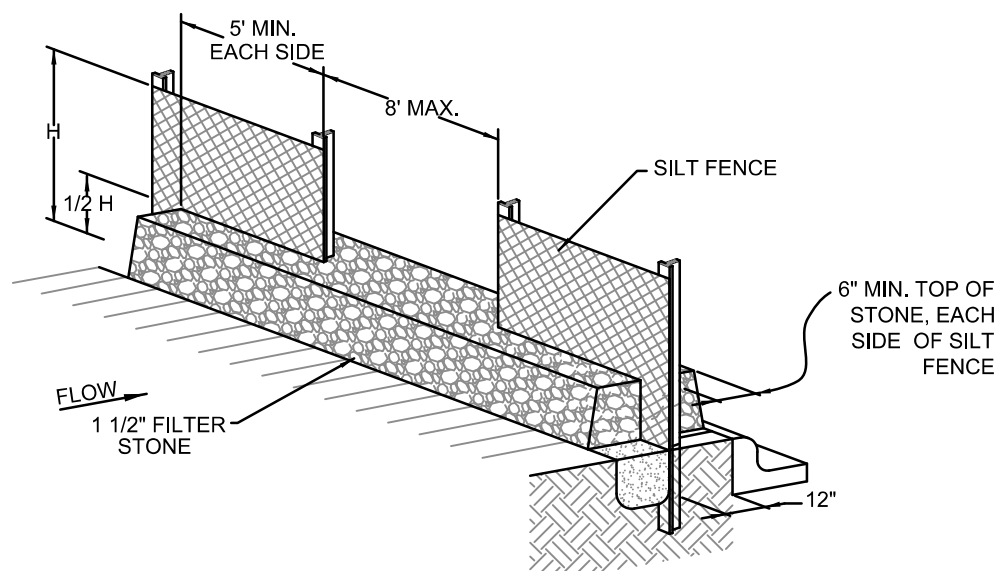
STANDARD CONSTRUCTION DETAIL -
